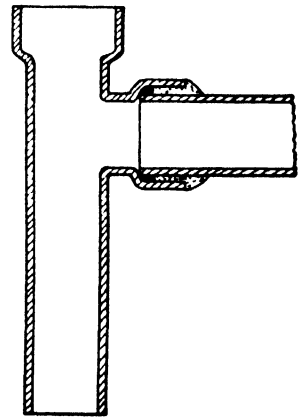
A tile assembly ready to be placed in the outlet end of a septic tank.
